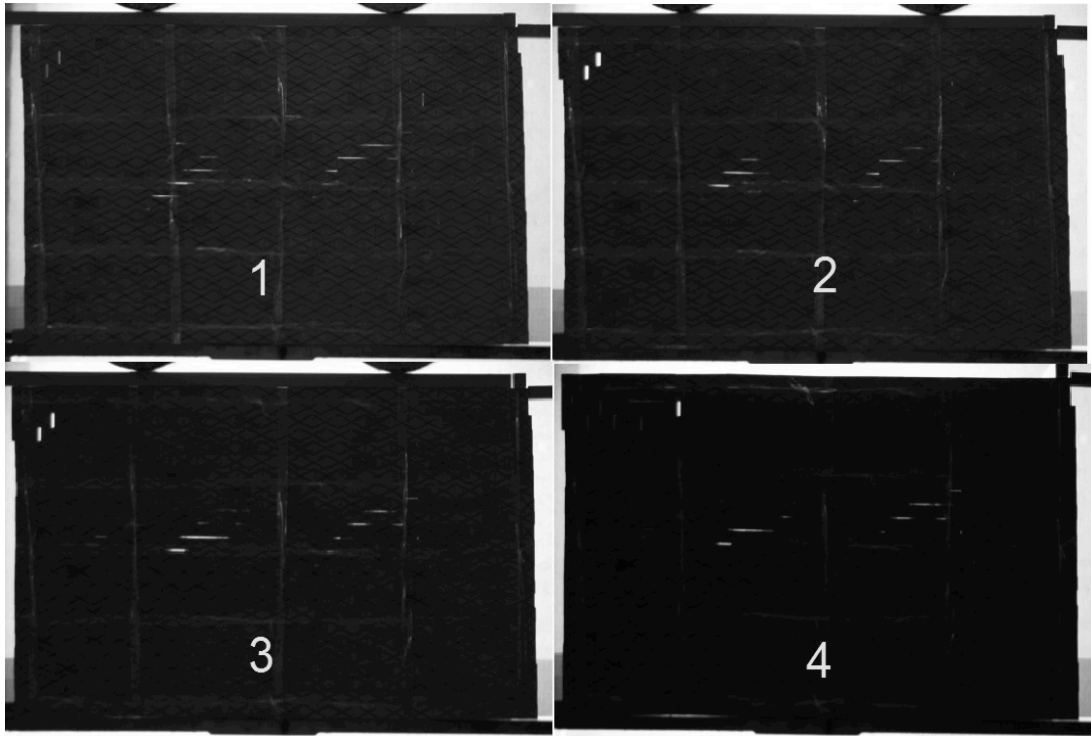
Retrofitted Non-glued solid wall specimens at 7 mm base displacement
